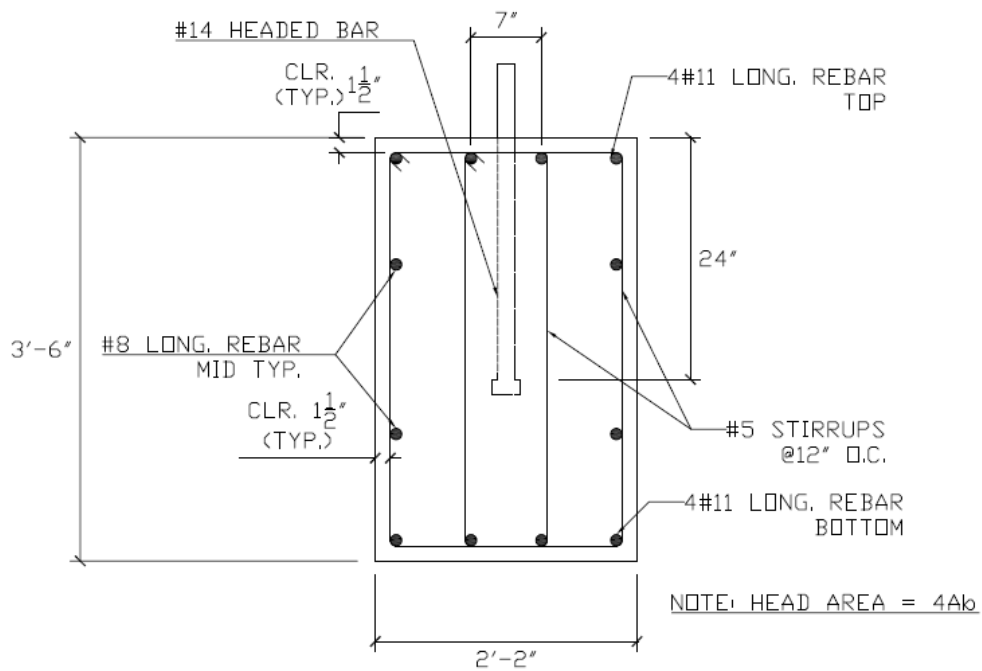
Cross-section view of Specimens 8 and 9 (Note: Specimen 9 had a head area of 9A_b)
